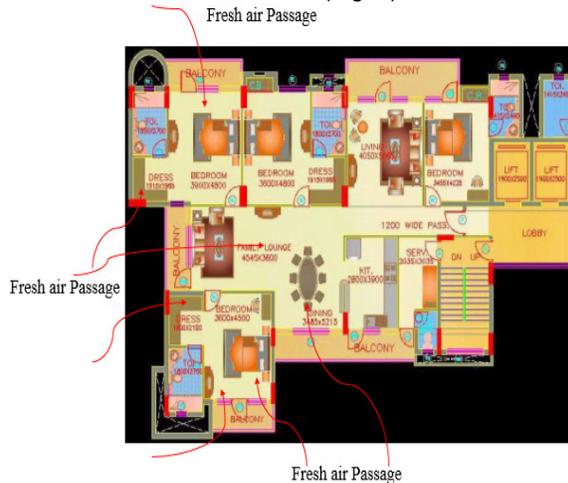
Floor Plan of 4BHK Showing the Natural Ventilation Access to the Internal Spaces. (Source: Authors' Sketch, 2020).
